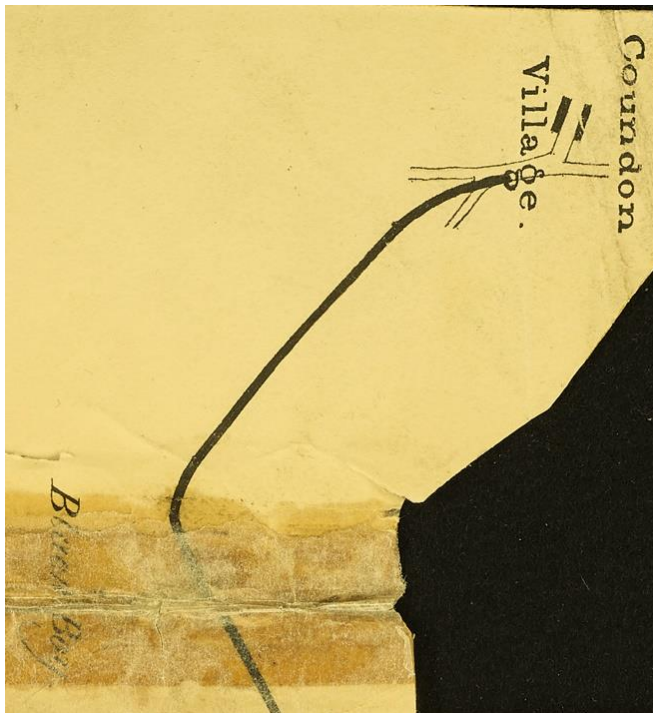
The proposed terminus of the Black Boy branch at Coundon Village as depicted on the 1823 plan of the S&DR mainline and proposed altered branches by Robert Stephenson and John Dixon (DRO QDP 0009/0001)
